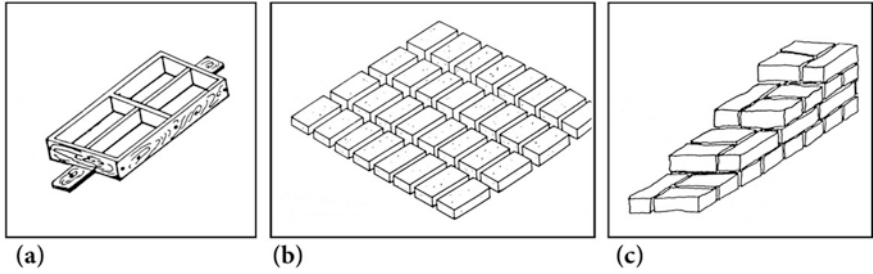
Use of adobe: (a) molding, (b) drying, and (c) constructing [18, 19]
